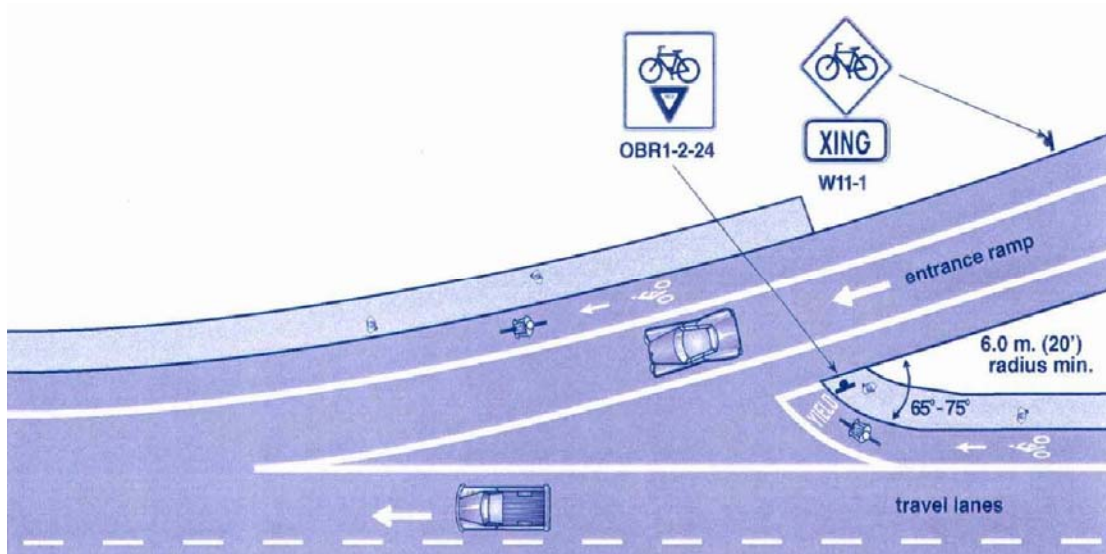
Signage and pavement markings encouraging bicyclists to cross ramp
